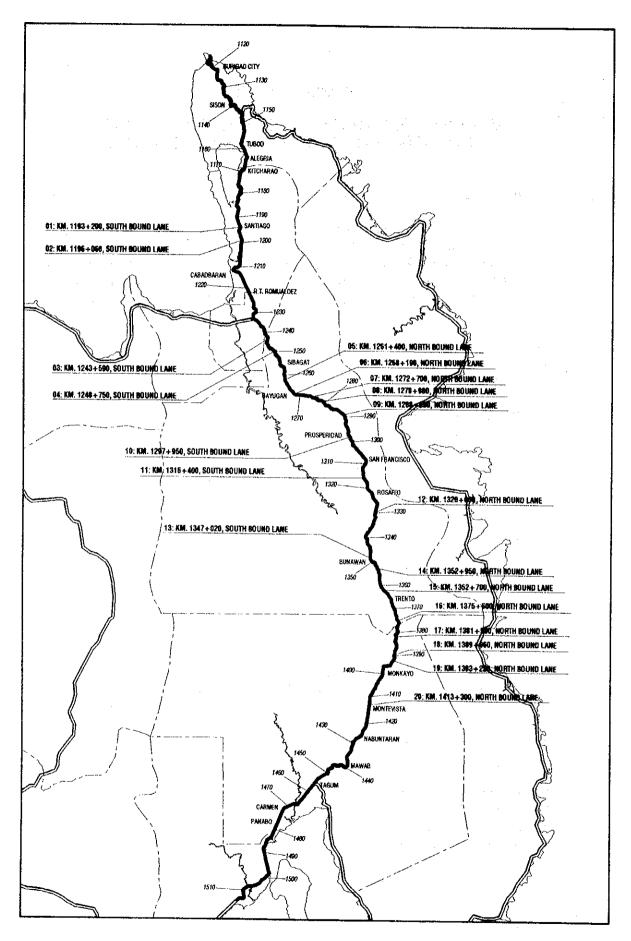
PAVEMENT CORING AND TEST PITTING LOCATION
